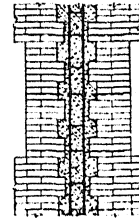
ADJOINING OF REINFORCED CONCRETE POSTS TO THE MASONRY
